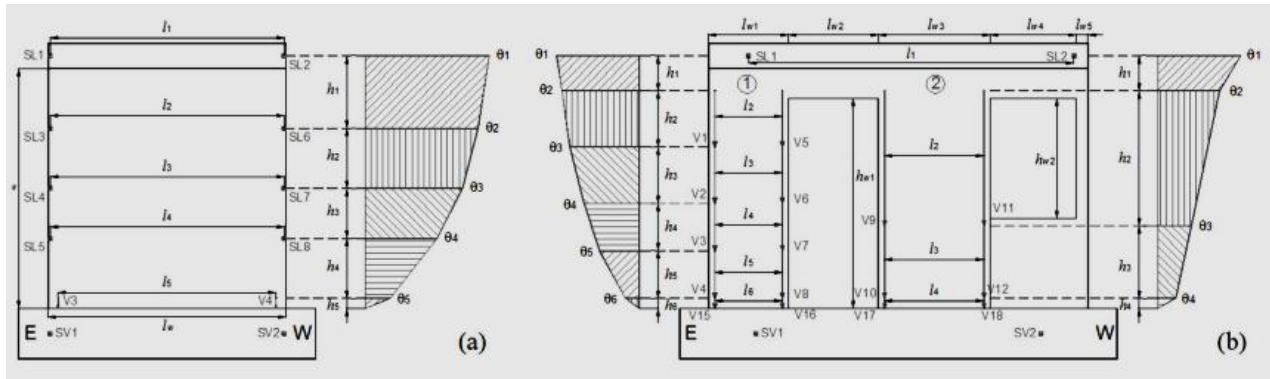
Proposed instrumentation Schemes: (a) Wall without opening (b) Wall with Opening
